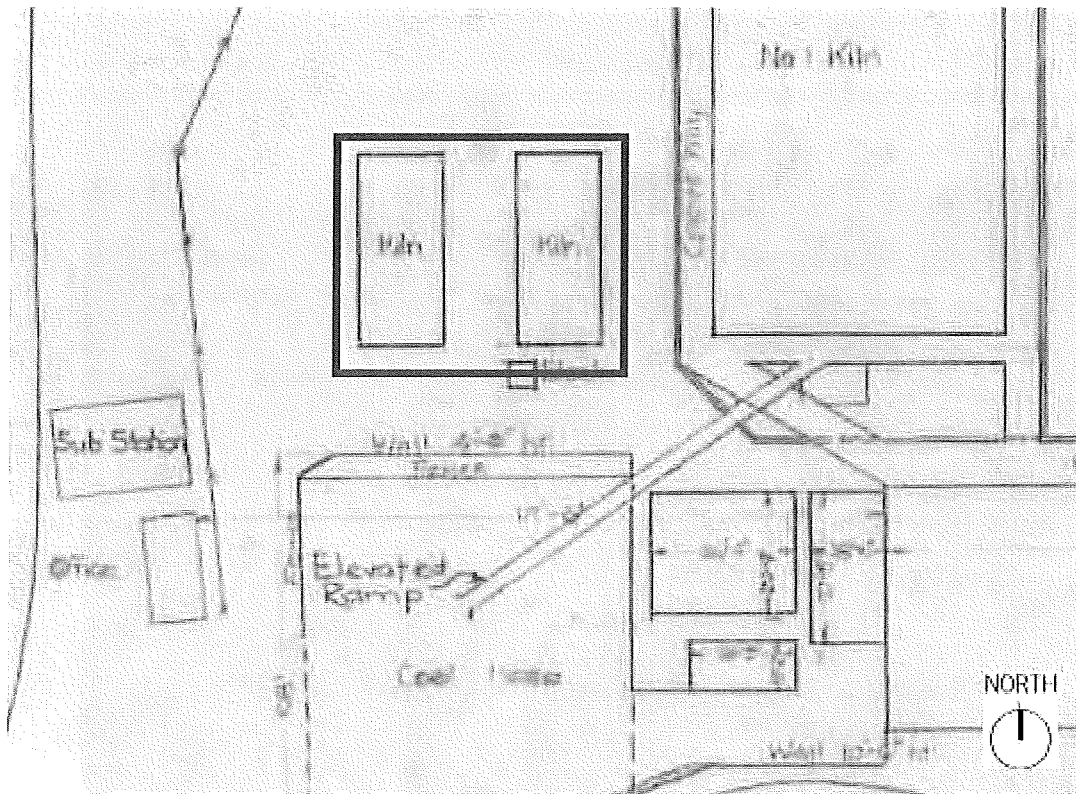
Detail of 1947 site plan, indicating the location of the two 'temporary' Downdraught kilns, to the south of the Staffordshire kiln ('No. 1 Kiln').
